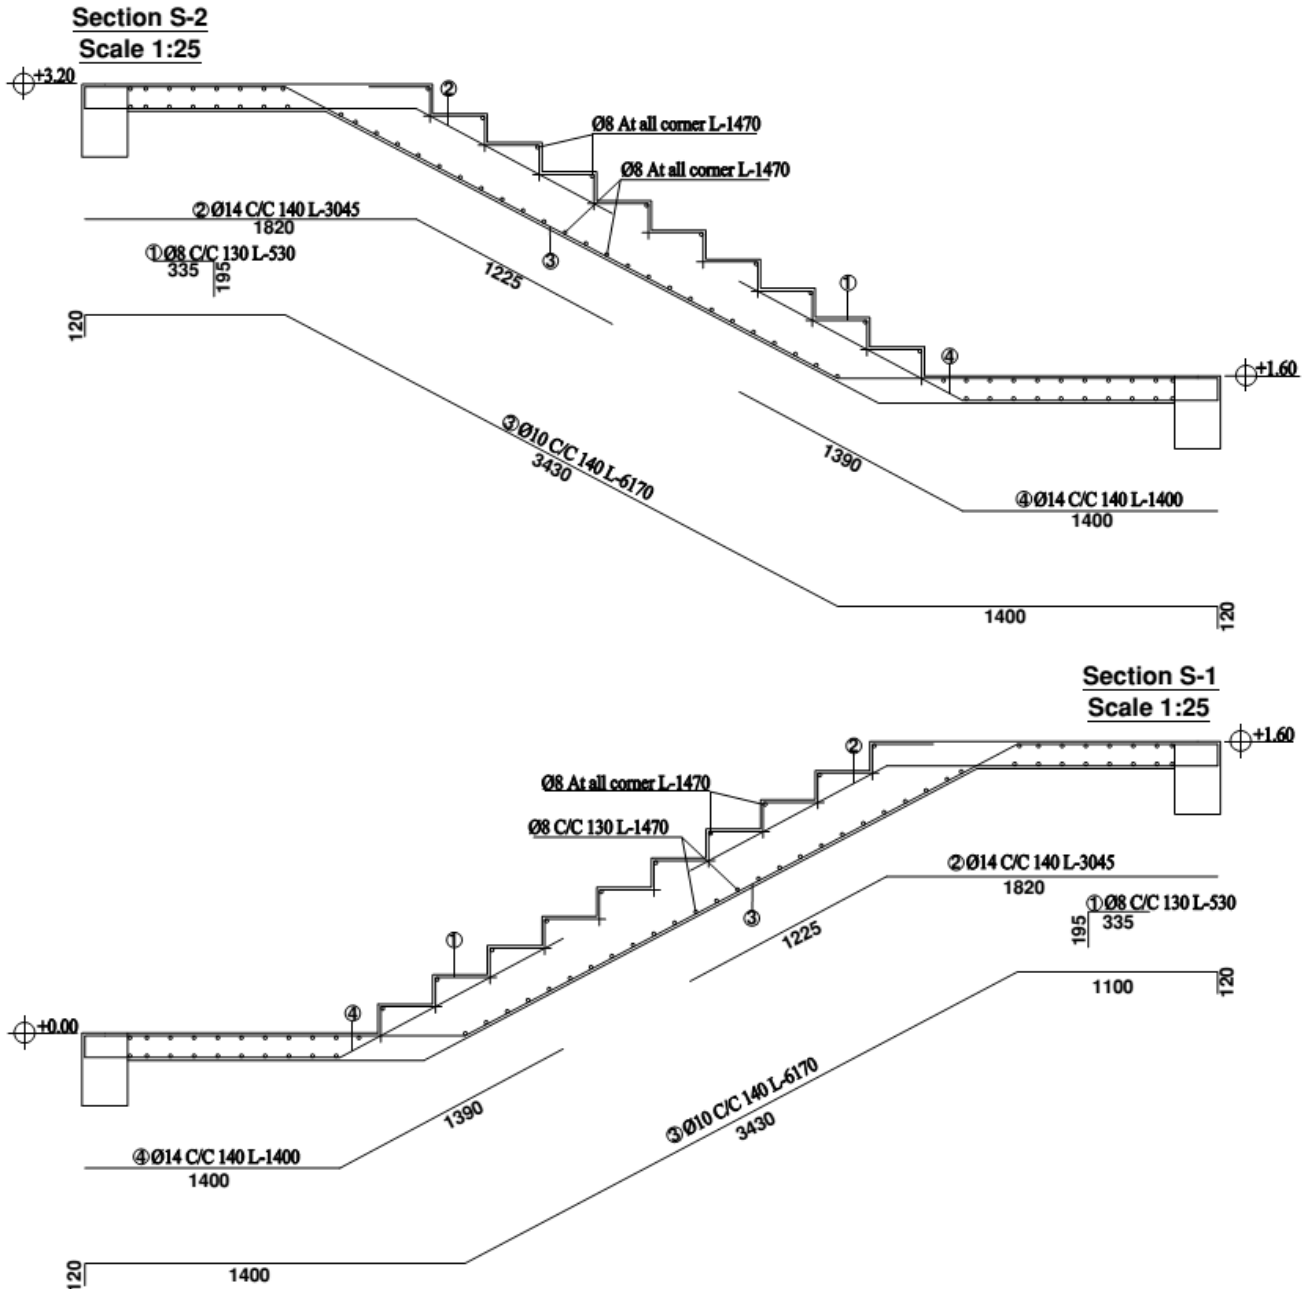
Sample staircase detailing for G+2 building with C-25 concrete
